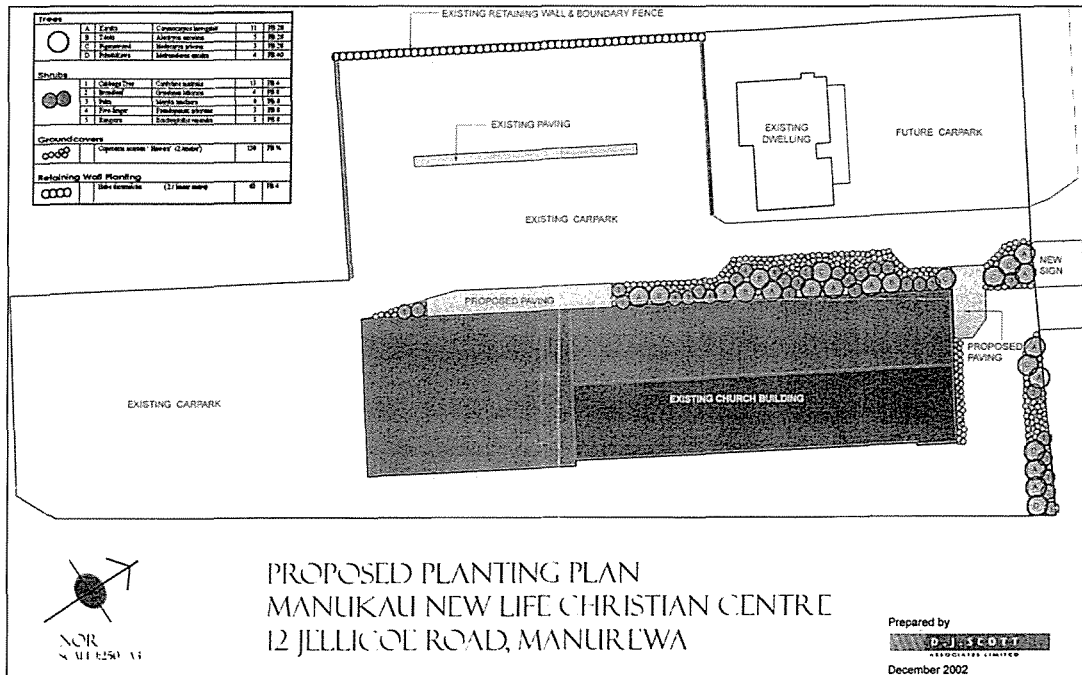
LANDSCAPE PLAN OF FINAL DESIGN
